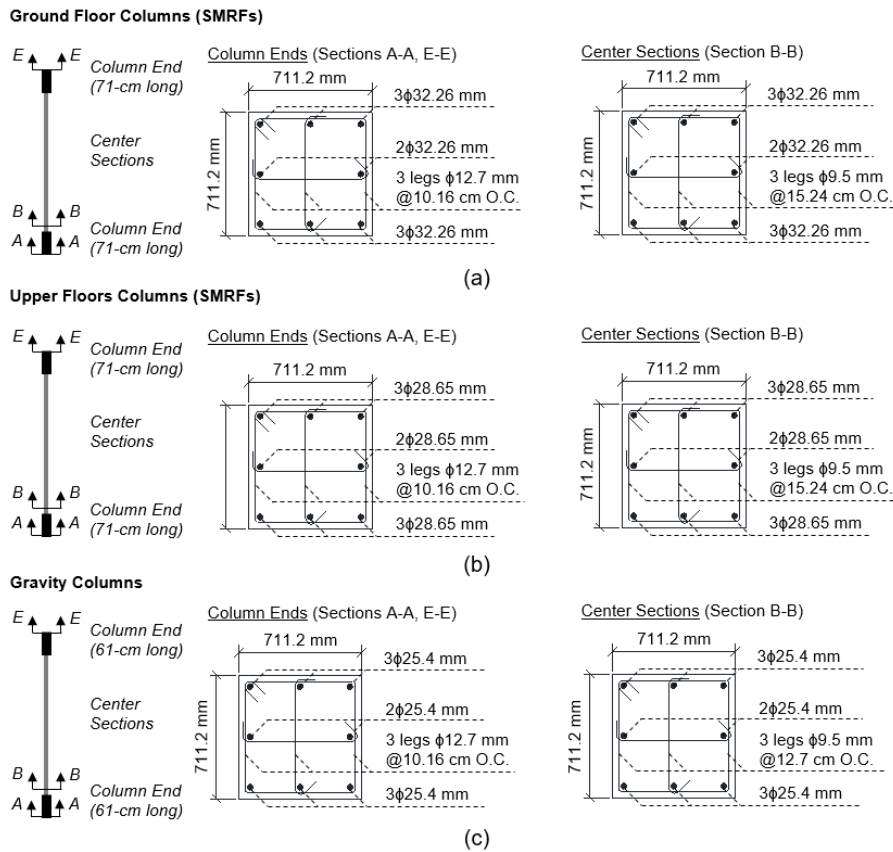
Column cross-section detailing: (a) SMRF columns at ground floor; (b) SMRF columns at upper floors; and (c) gravity columns.
